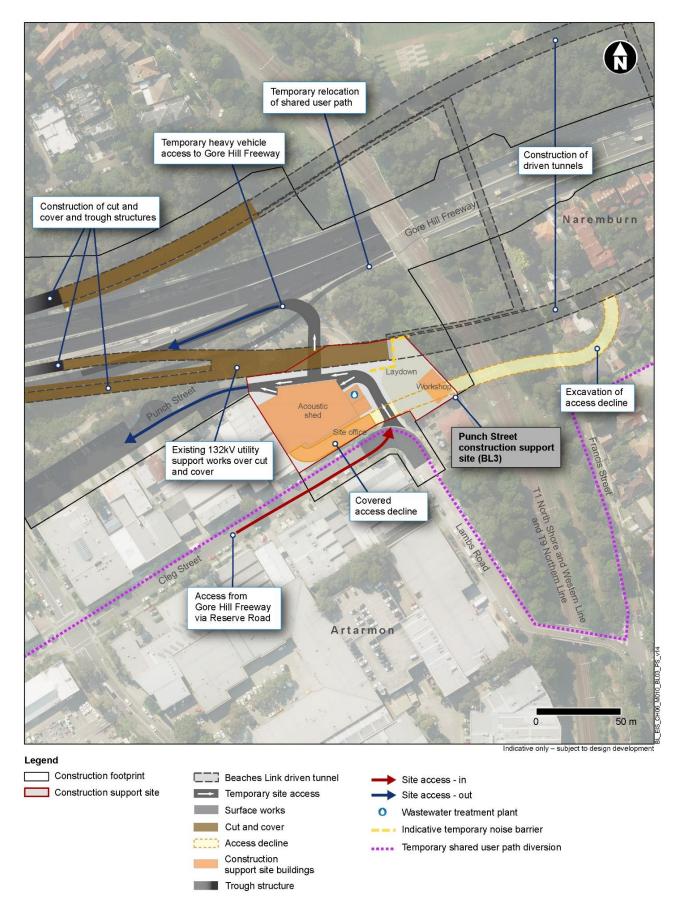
Indicative layout - Punch Street construction support site (BL3)
